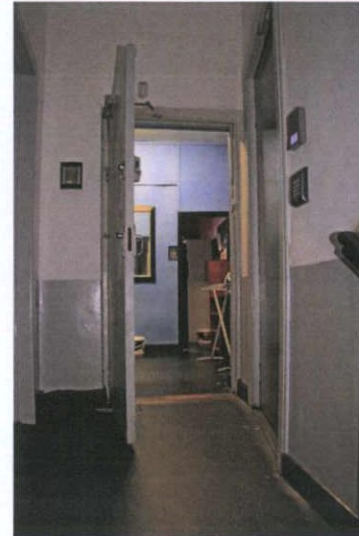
S-1 – View to east from second floor landing "no 51 photo key"
